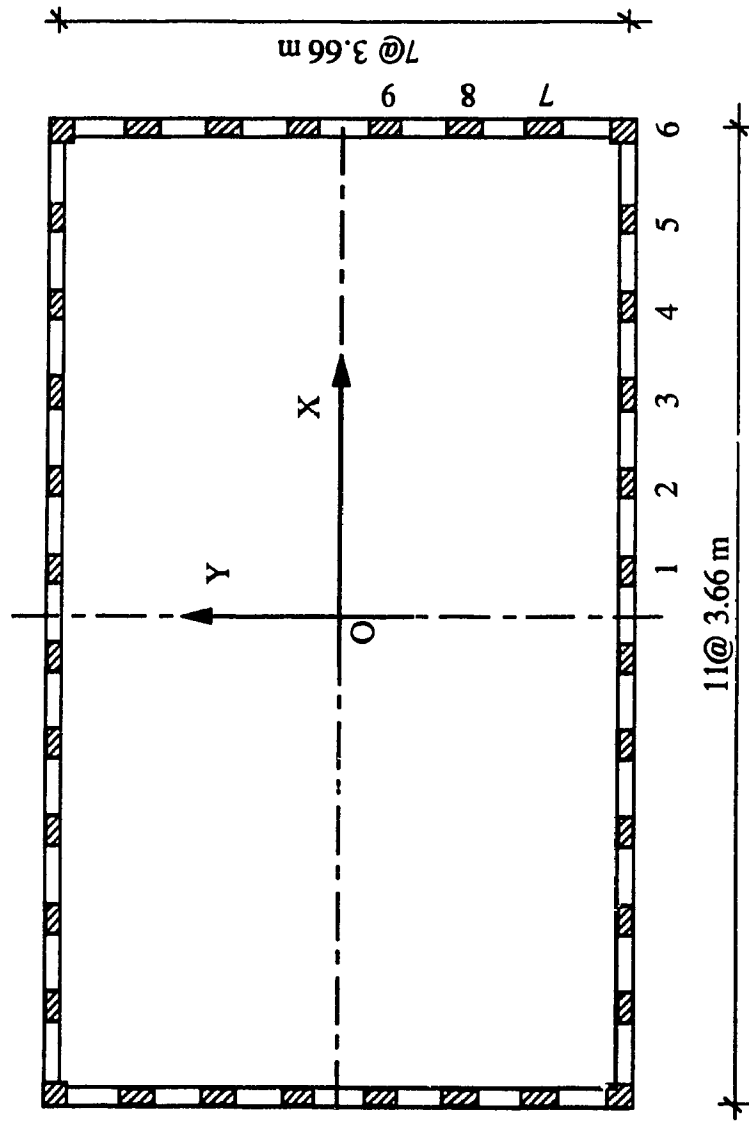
Plan layout of symmetric 30-story framed tube structure subject to: (1) pure torsion; (2) lateral loading
